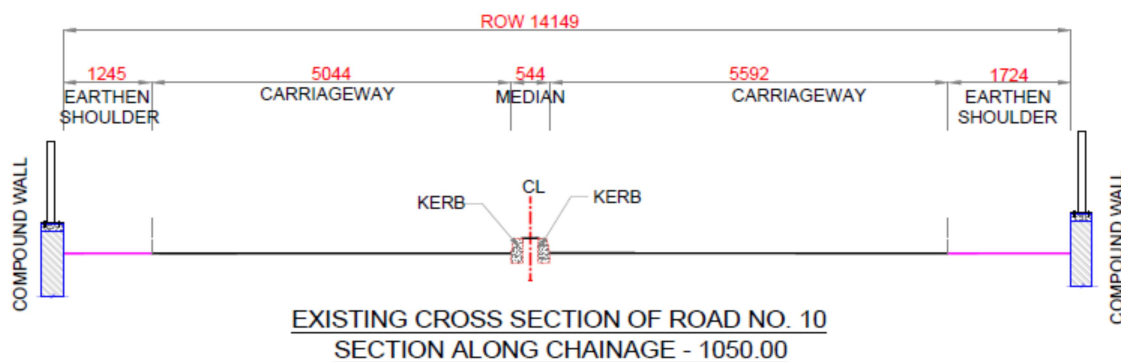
Existing Cross Sections, Site Photographs and MUDA Master Plan layout of KSR Road
